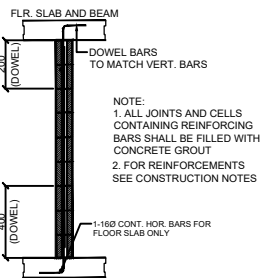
TYPICAL SECTION OF MASONRY PARTITION REINFORCEMENTS
